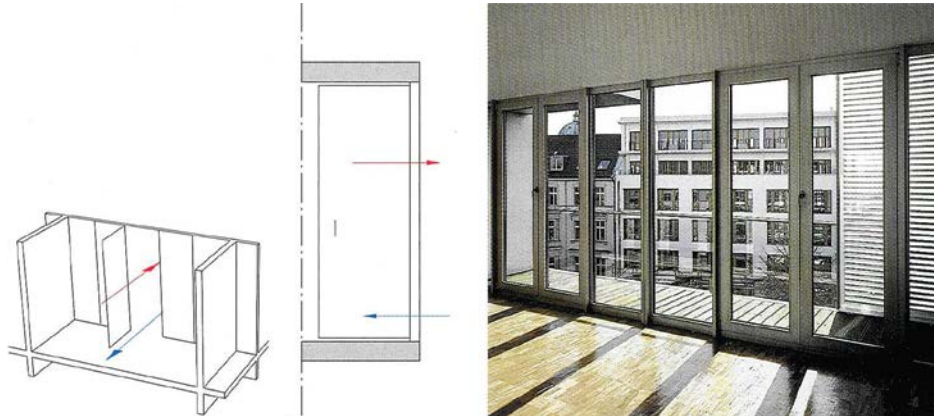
Window ventilation, openings set all over the height of the facade, Residential business building, Gruntuch Ernst, Berlin, 2001
